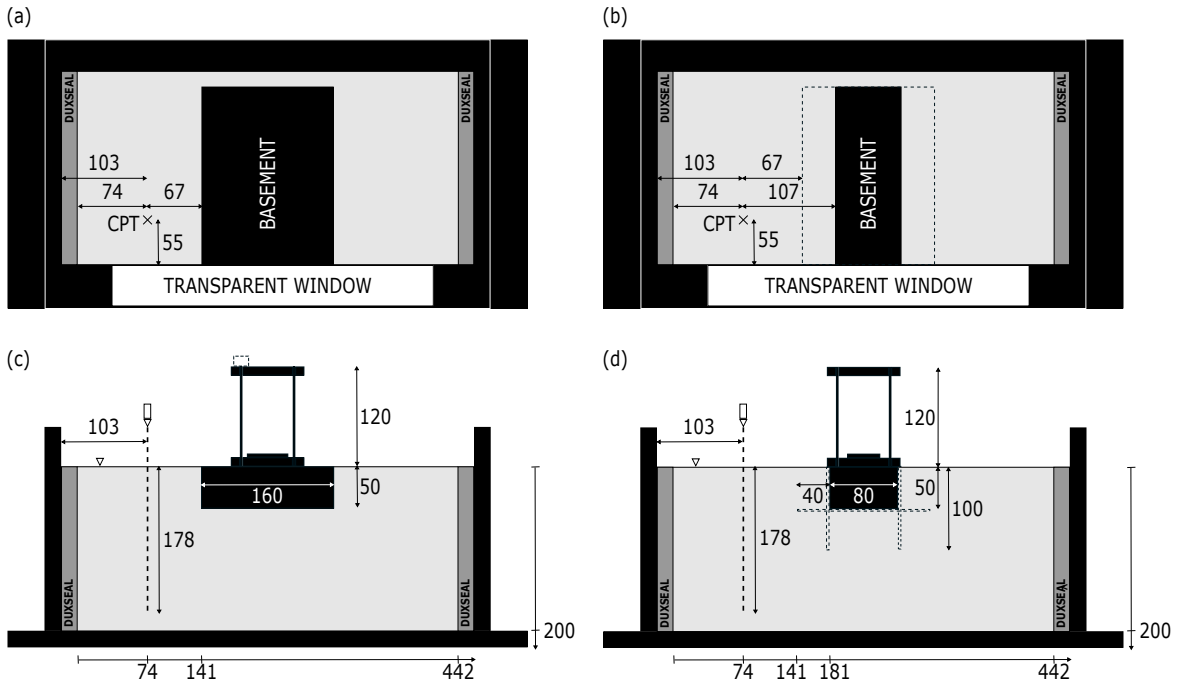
Schematics of Cone Penetration Testing locations, dimensions in mm at model scale: (a) Plan view for tests with structures with wide basements, (b) Plan view for tests with structures with narrow basements, (c) Cross sectional view for tests with structures with wide basements, (d) Cross sectional view for tests with structures with narrow basements.
